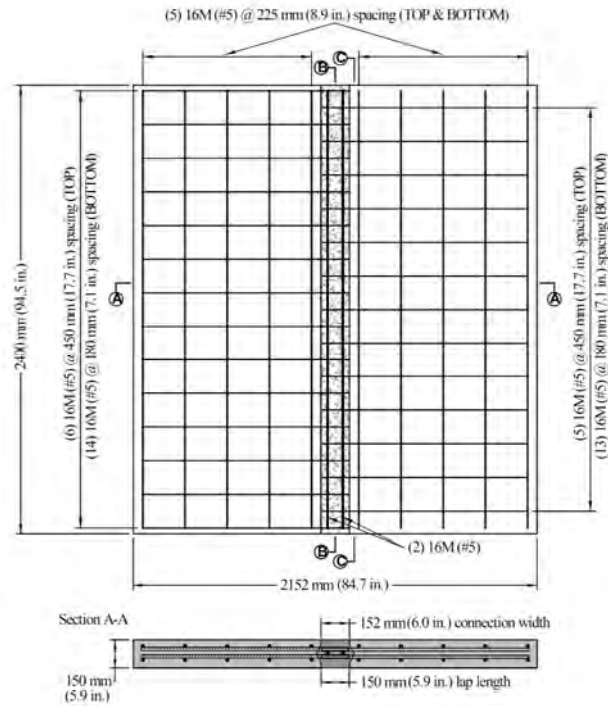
Straight detail and panel layout used in FHWA study HRT-11-023
